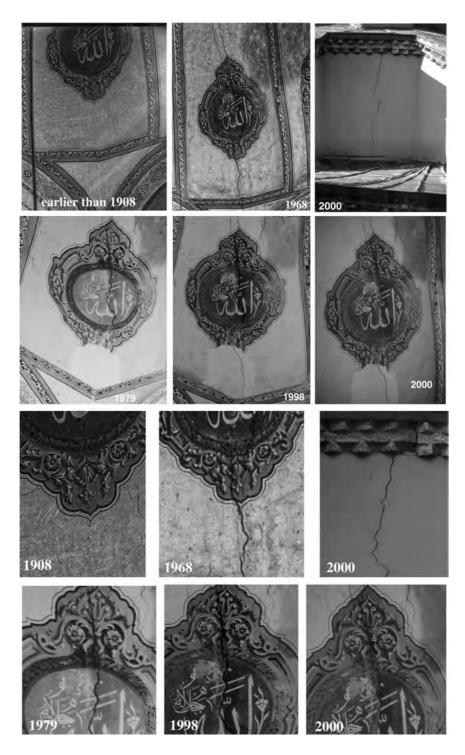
Crack C1 inside and outside the building, images taken in the last 100 years
